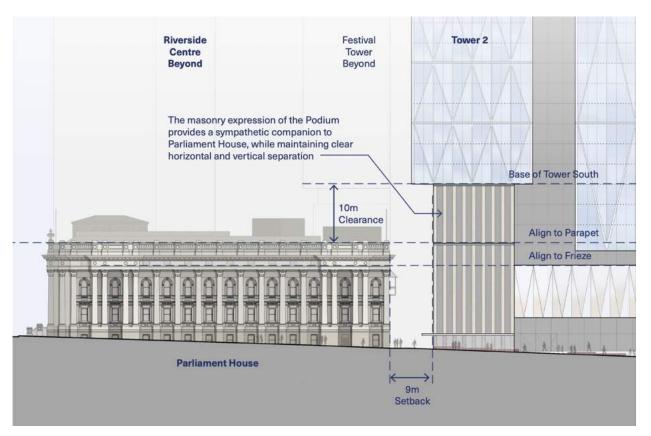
Eastern elevation Parliament House 'clearance zone' connection
